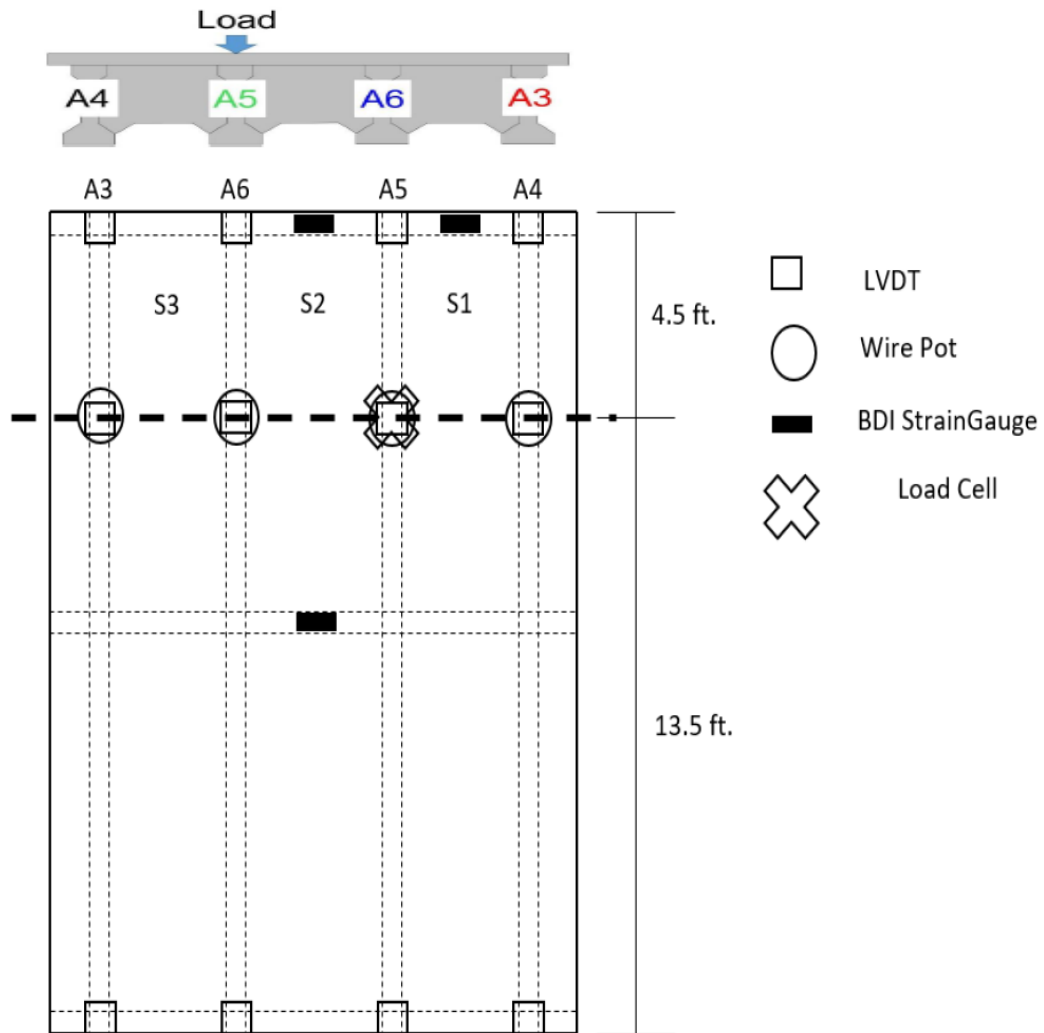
Section and plan of test bridge (Courtesy: Dr. Murray)
